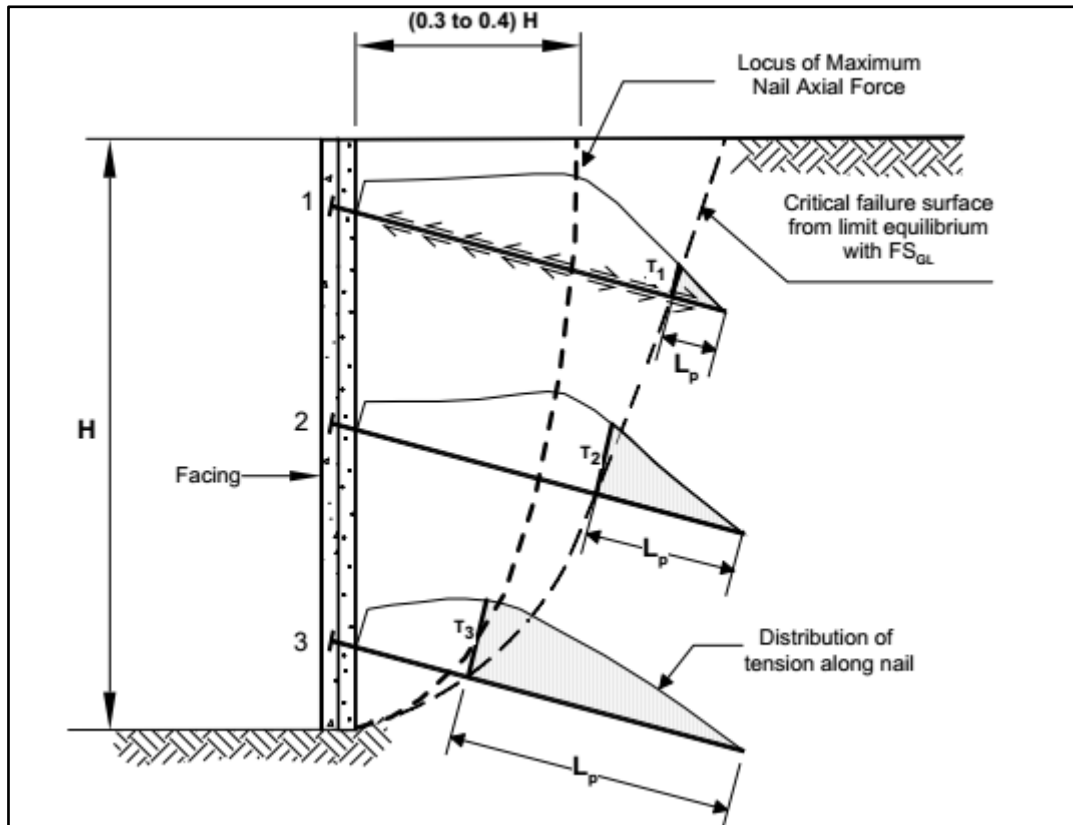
Location of Maximum Tensile Force in the Soil Nail Wall (Lazarte, 2003)
